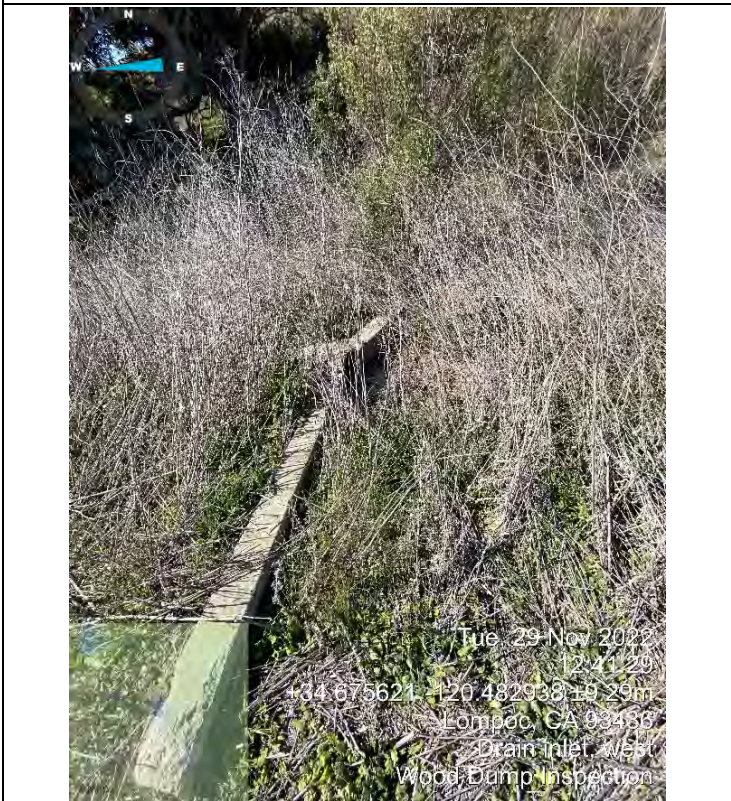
Southwestern Overside Drain Inlet and Wingwall – concrete in good condition, but inlet area is overgrown with vegetation (facing west)
